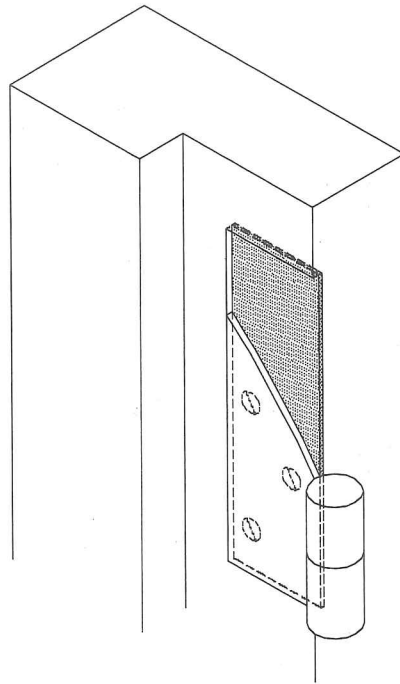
Intumescent sheet fixed behind a butt hinge blade
